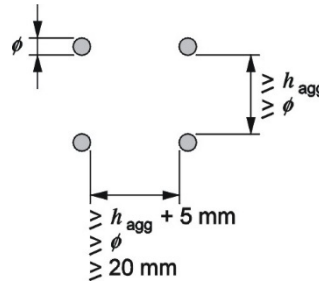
Minimum clear spacing between pre-tensioned tendons
